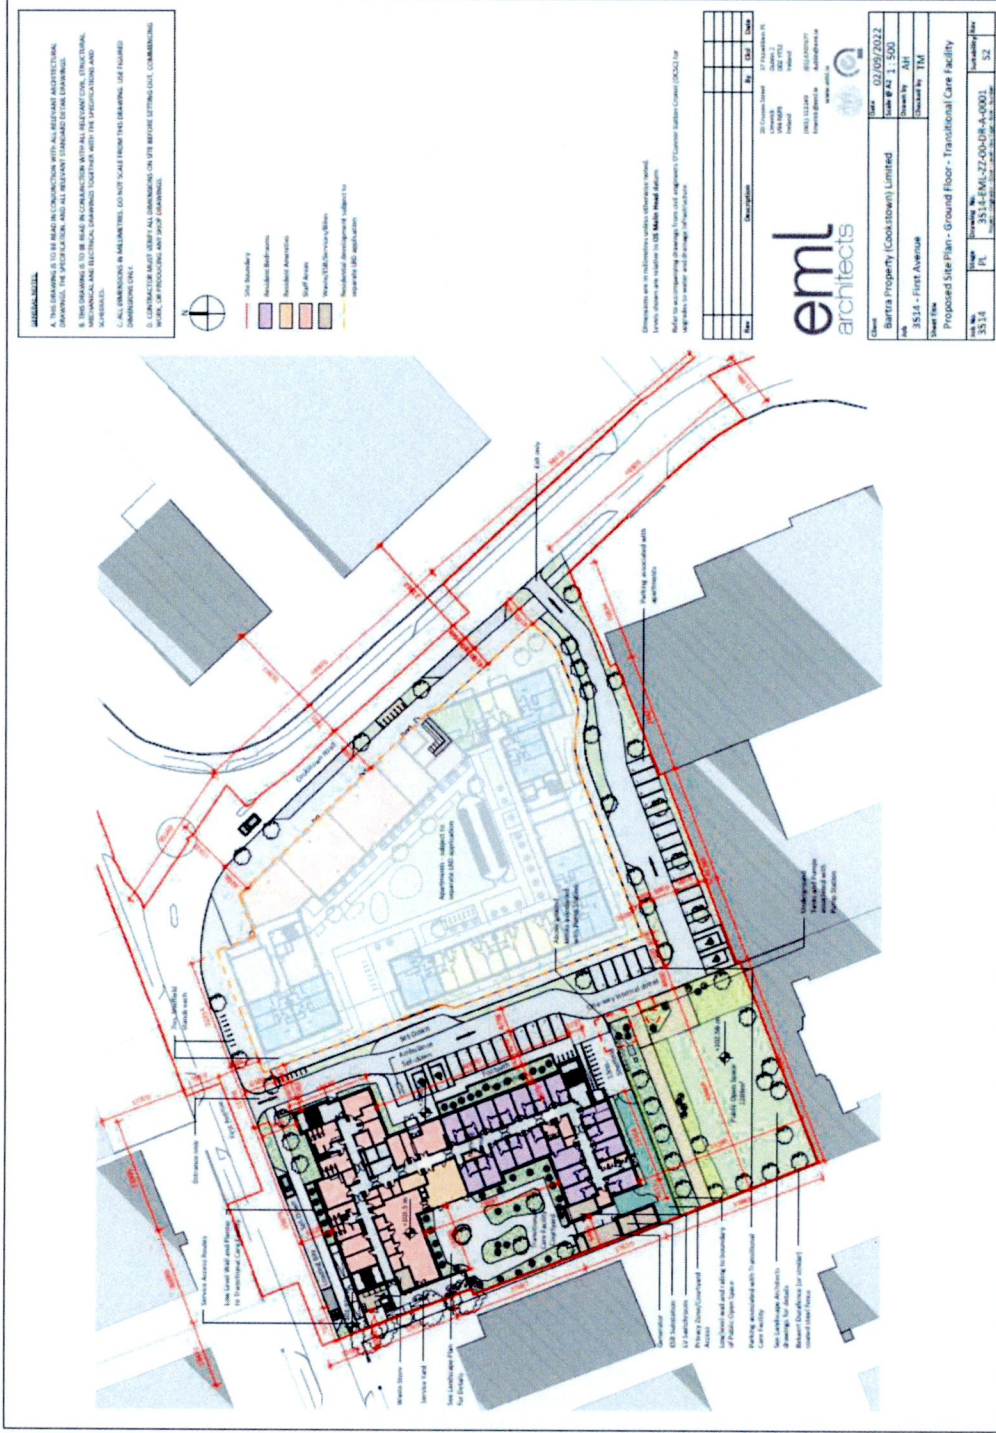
PROPOSED SITE LAYOUT – GROUND FLOOR (EML ARCHITECTS, 2022)
